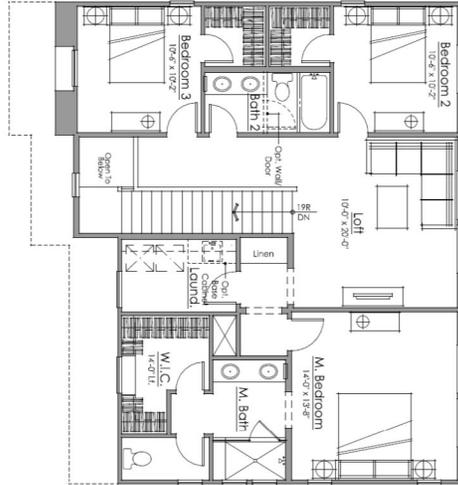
Floor Plans, Elevations, Roof Plans
